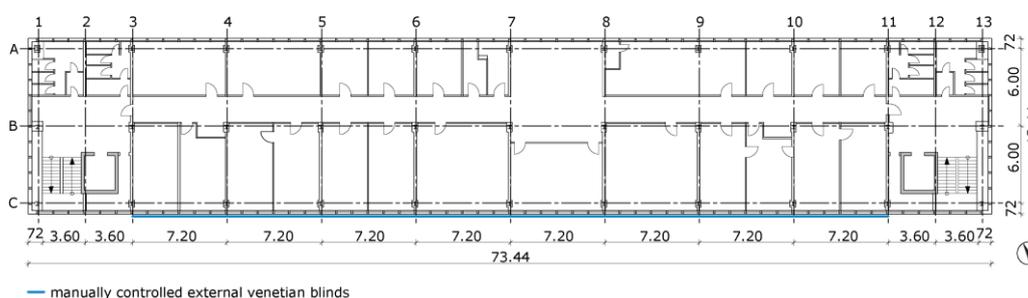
Floor plan of the investigated type Leipzig and sun protection measures in the actual state.
